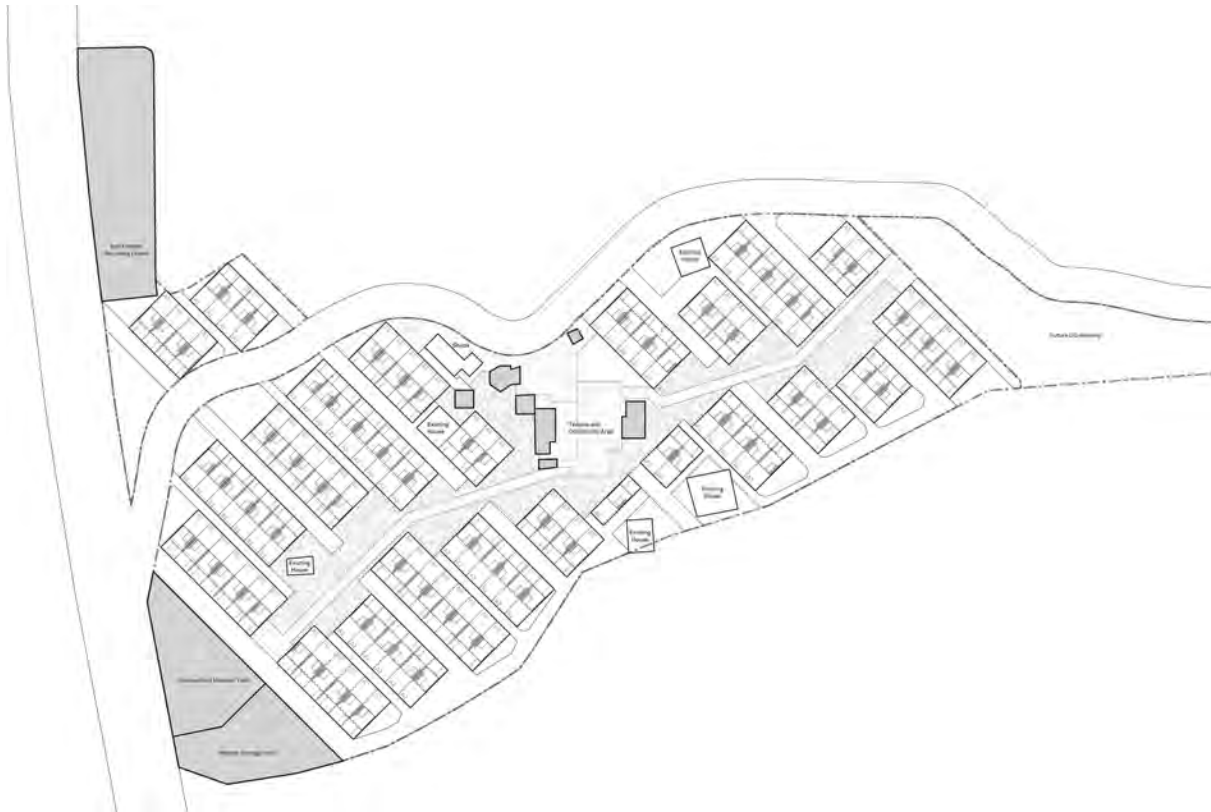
Initial site plan for the Ramdevnagar community RAY re-development. Site Plan re-drawn by David Moses.
